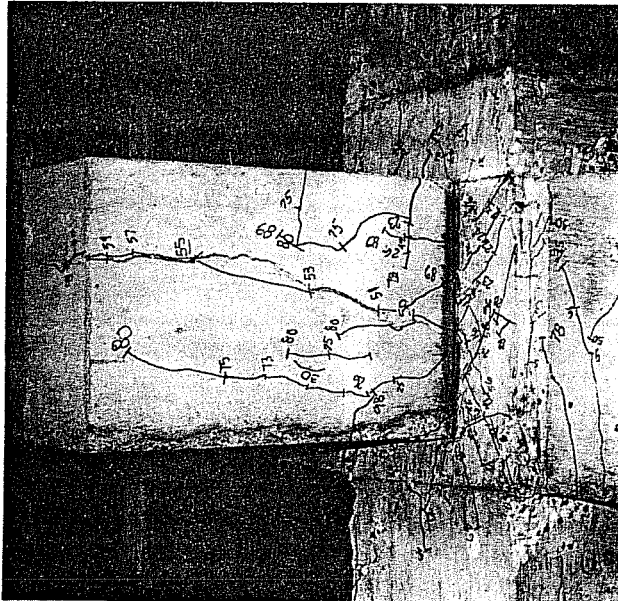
Crack propagation on lateral beam of Specimen IX
